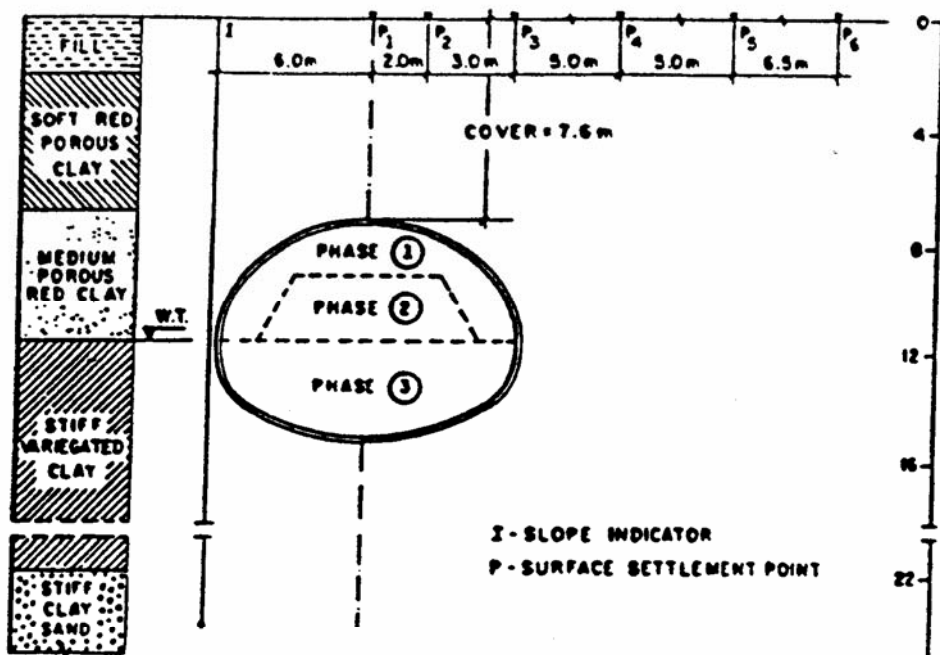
The Paraíso Tunnel Construction Scheme and Instrumentation
